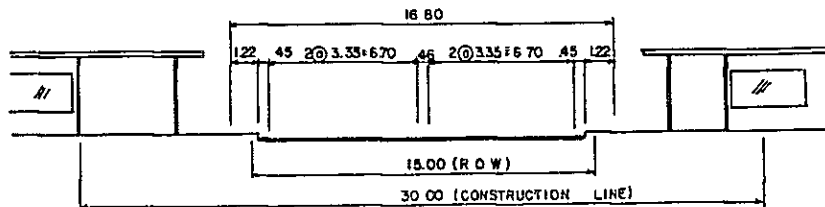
SHORT TERM CROSS SECTION OF VIA EL PAICAL
